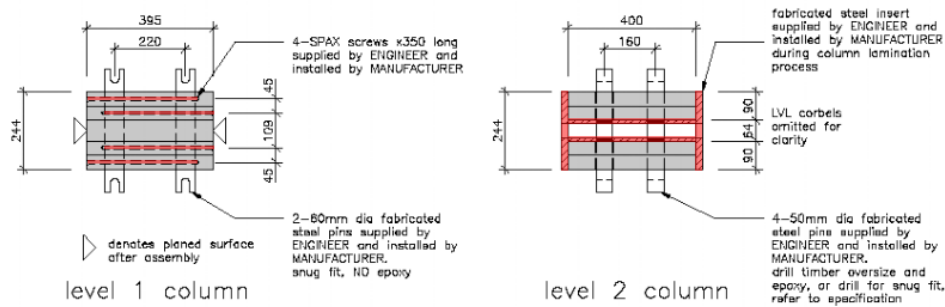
Joint details of test structure showing screw reinforced upper joint and steel reinforced lower joint (Newcombe, 2011)
